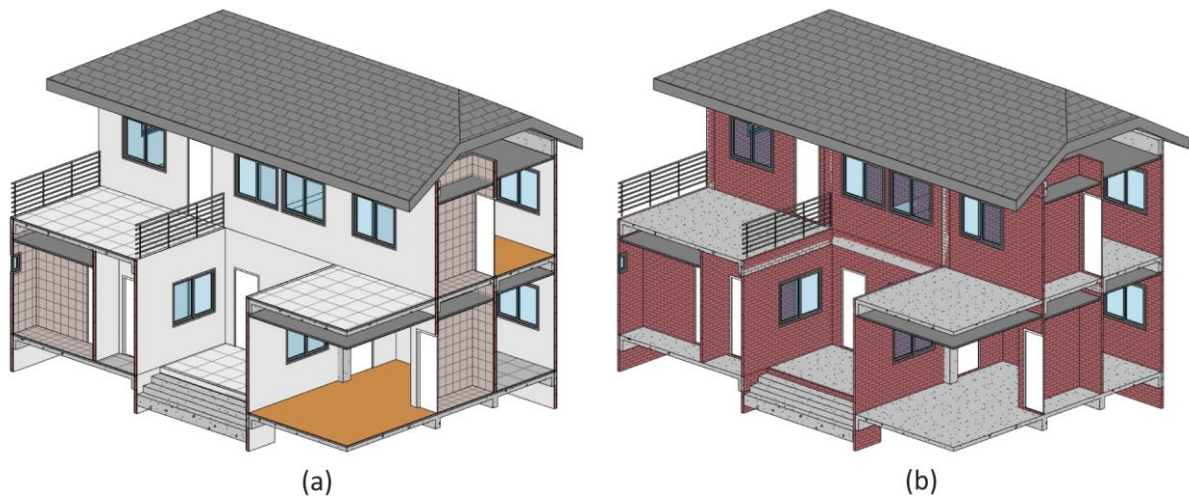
Example of (a) the original BIM model and (b) the BIM model after changing the original walls and floors into the walls and floors with only a core structural layer (process 2).
